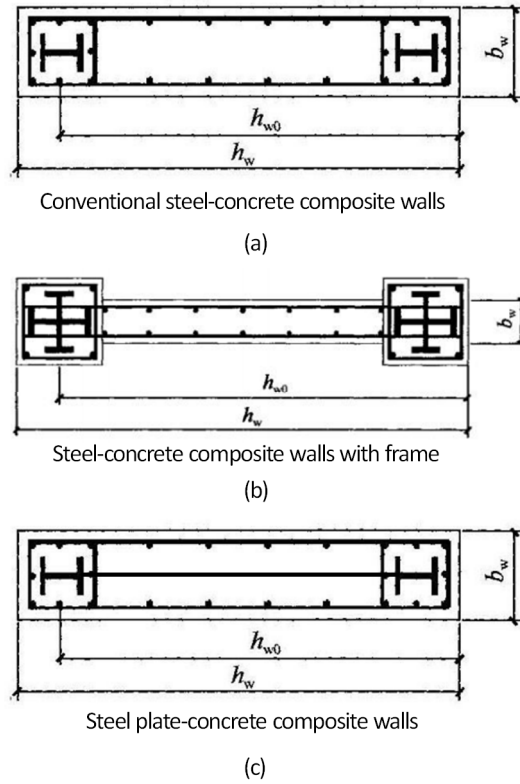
Section configurations of SC composite walls in JGJ 138 (2016)
